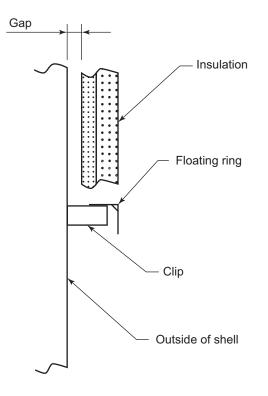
Insulation Support System with Clips Welded to the Shell Supporting Floating Rings
